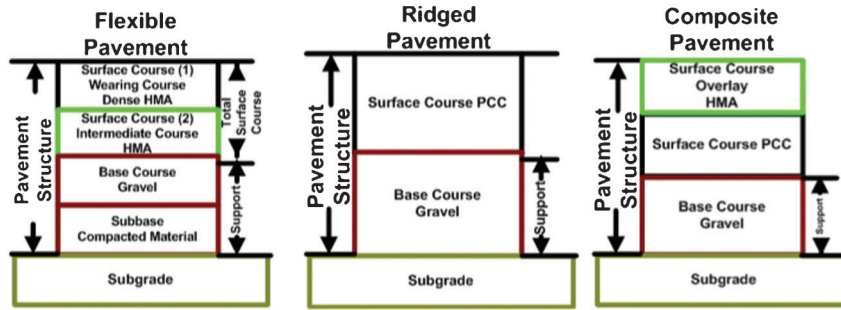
Typical cross sections of flexible pavement (HMA or WMA), rigid pavement (PCCP) and composite pavement (10).
